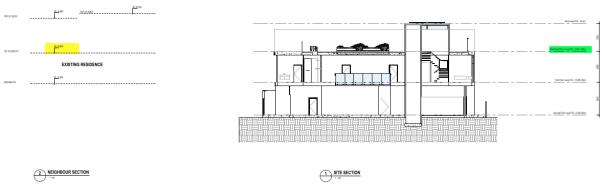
Cross-Section - No. 26 Strome Road (Yellow) No. 23 Carron Road (Green)
